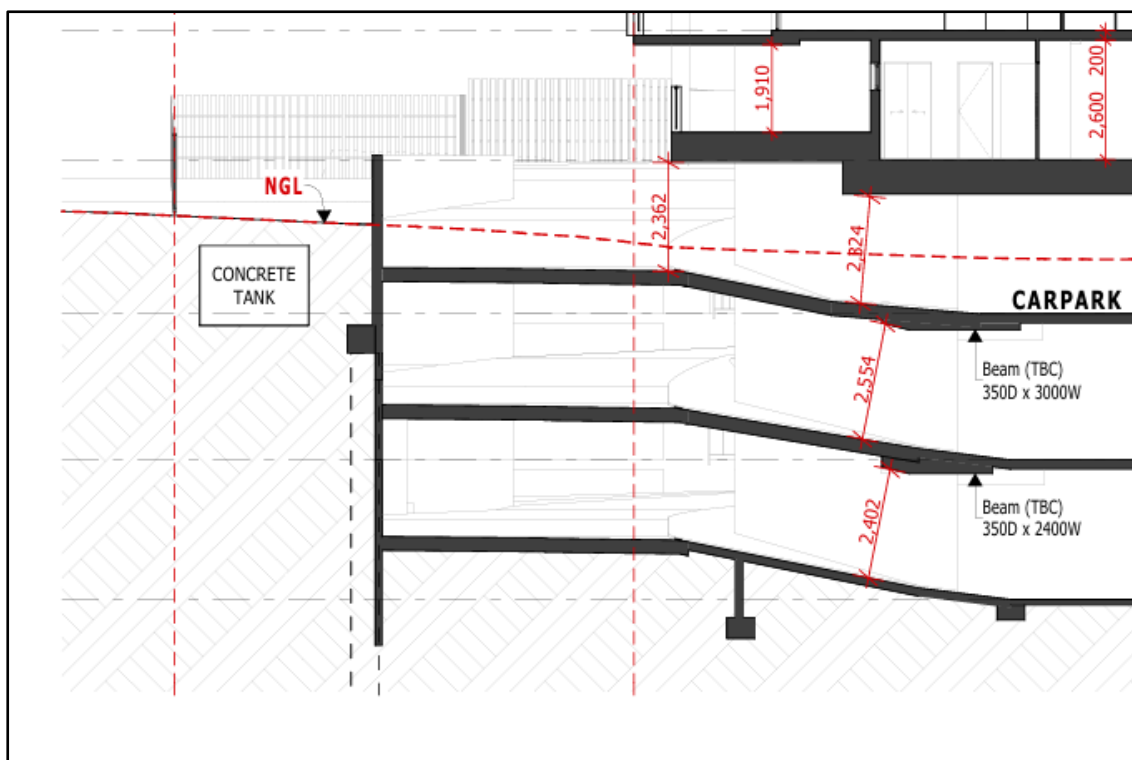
Concrete Stormwater Tank Section – Extract (Source: RC+ Design)
